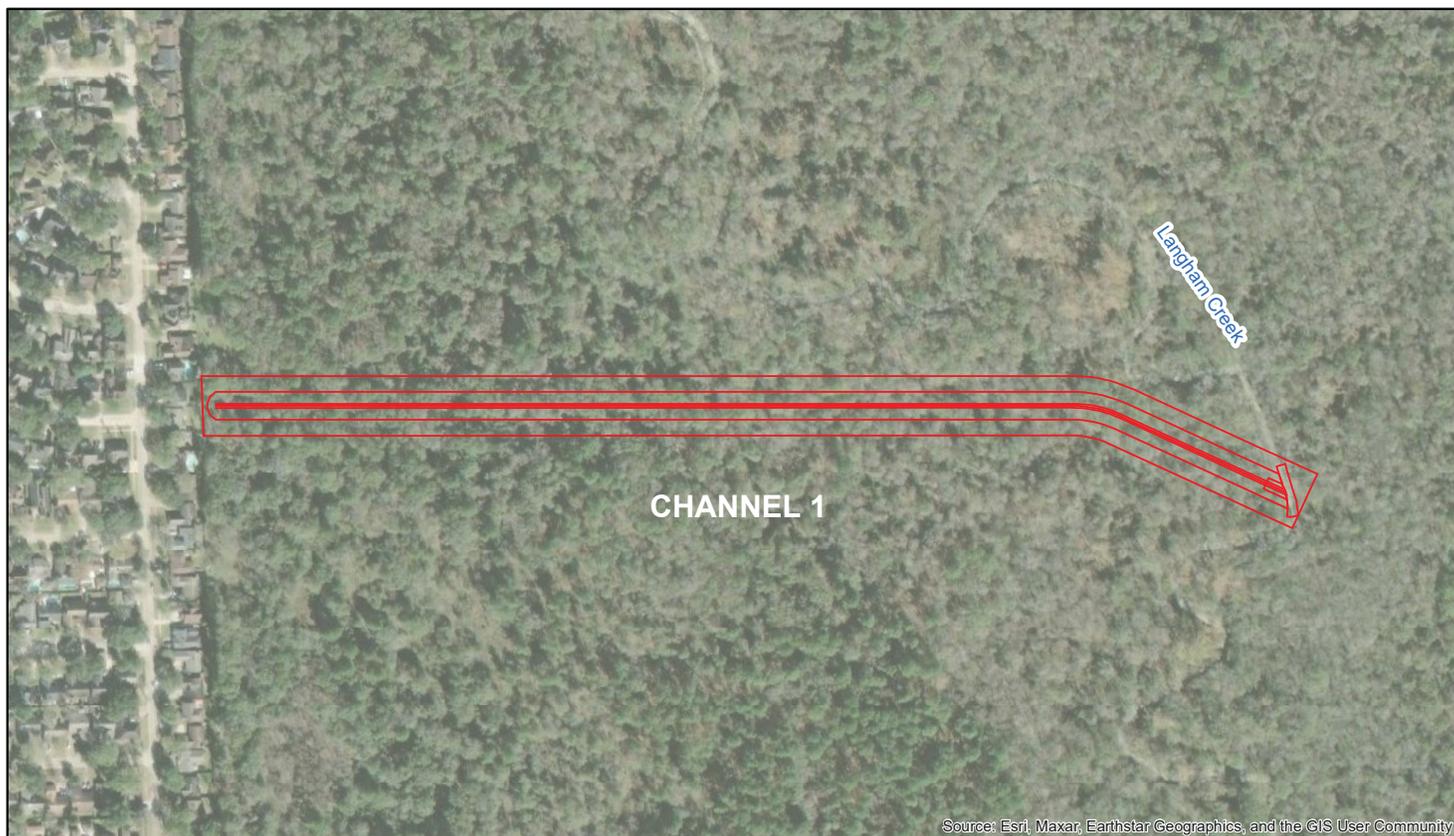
SHEET 1 PROPOSED SWALE 1 PLAN VIEW
